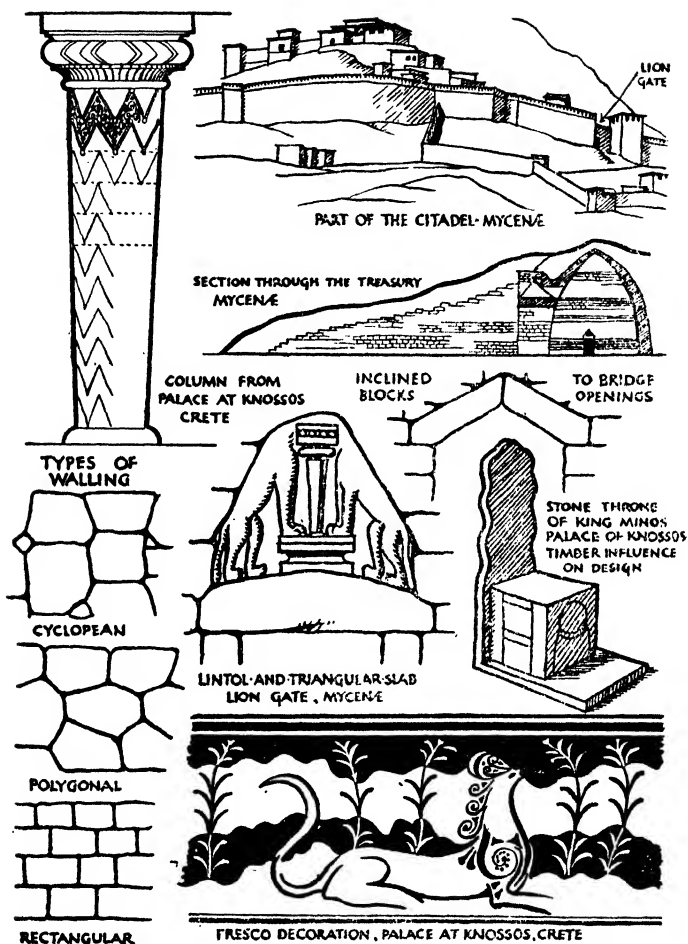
EARLY GREEK (MINOAN) BUILDING
